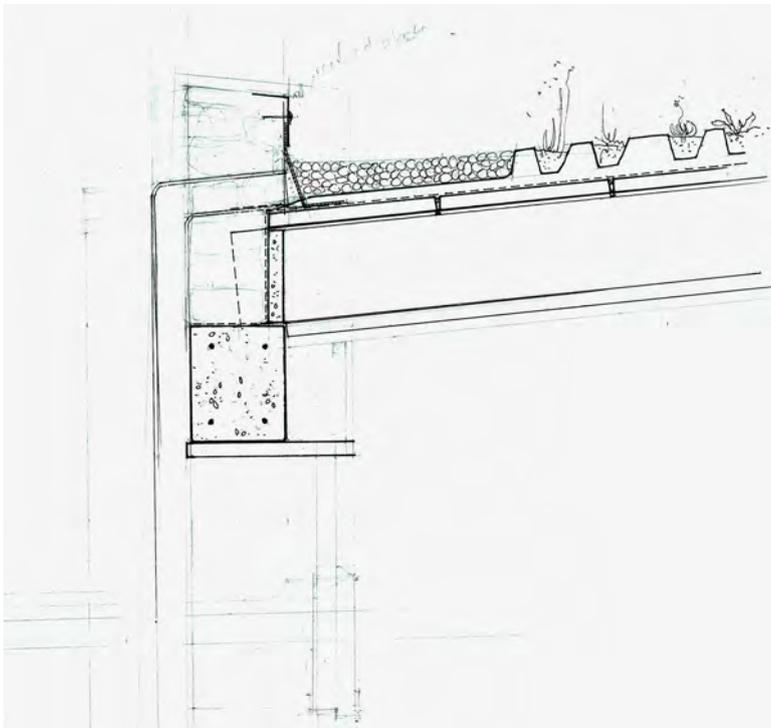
Raked screed planted roof and gutter, SCALE 1:20 [detail from figure 6.8] (Author 2017)
